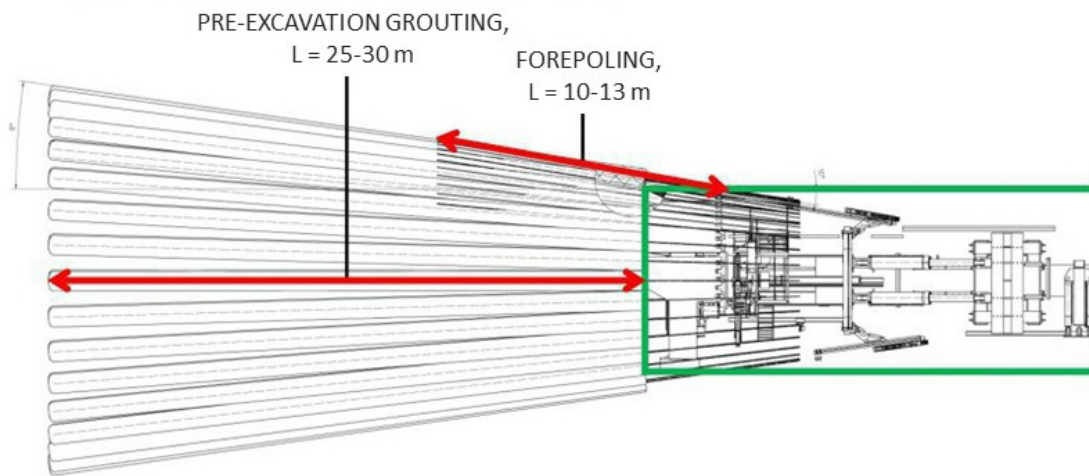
Open gripper TBM and schematic layout of drilling ahead of the tunnel face for pre-excitation grouting and forepoling. Vertical longitudinal section.
